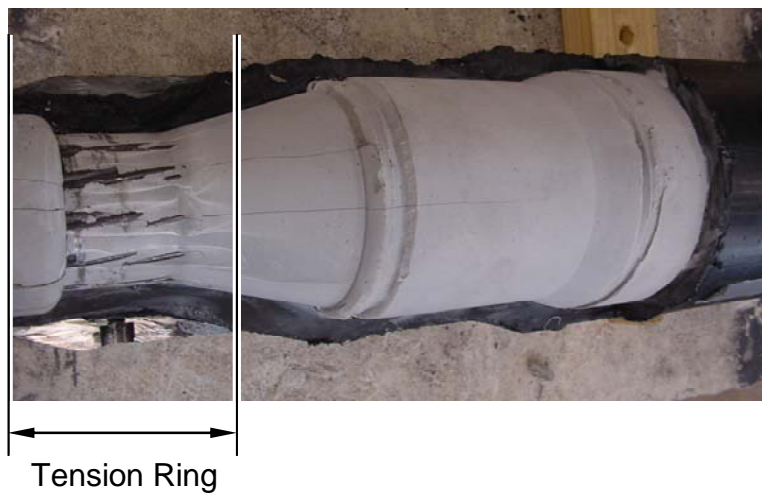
Hairline Transverse Grout Cracks - Fred Hartman Bridge
